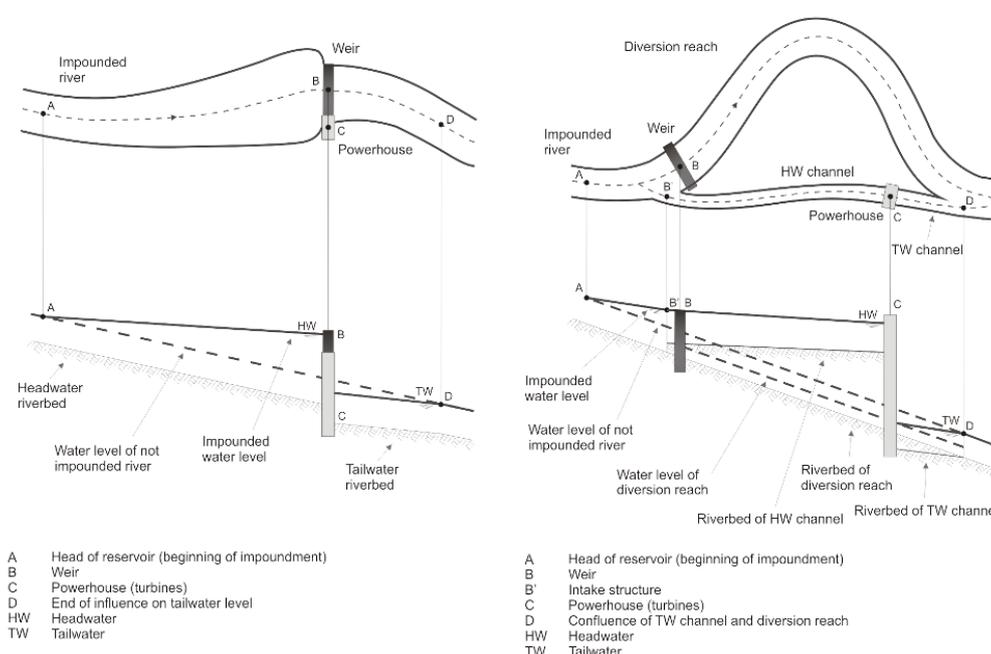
Schematic overview of a run-of-river hydropower plant: river power plant (left) and diversion plant (right) (after Habersack et al., 2011)
